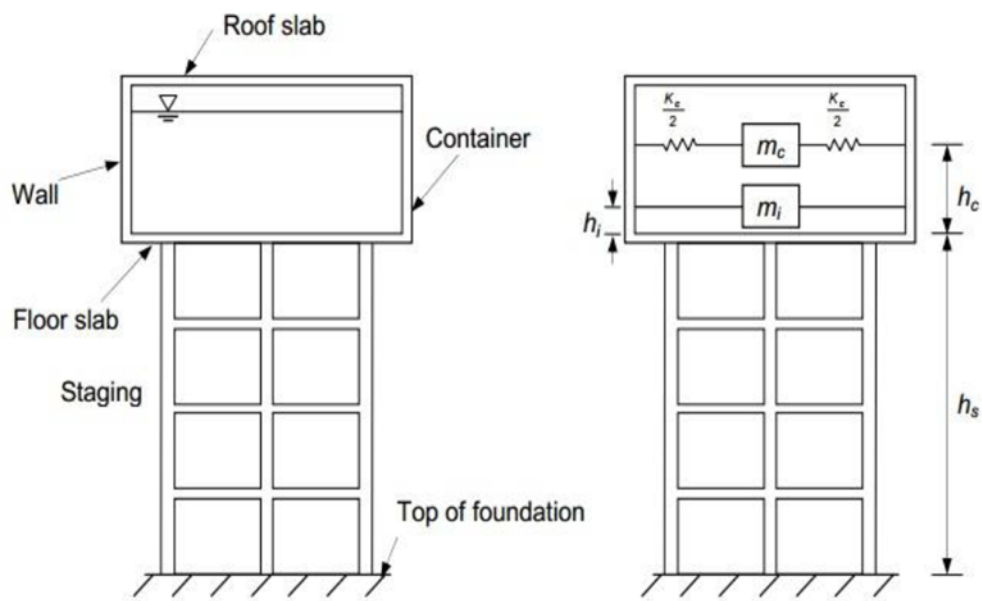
Elevated tank and the Spring mass model of elevated tank
